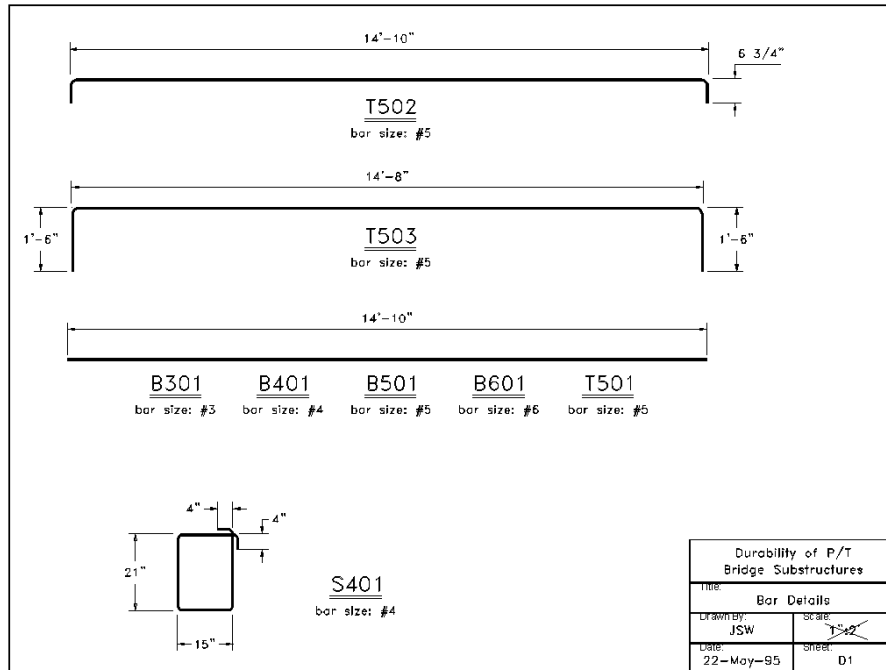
Sheet D1: Bar Details <sup>2</sup>
